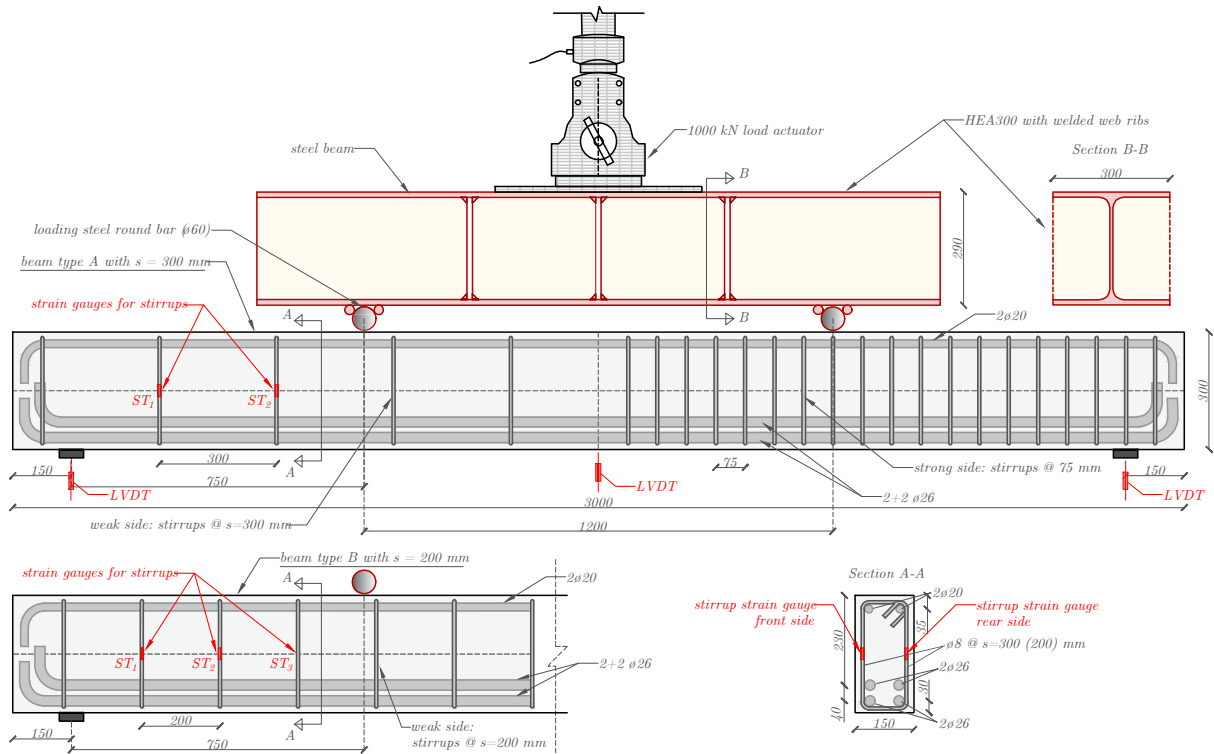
Test setup, instrumentation, and details of steel reinforcement (units in mm).
